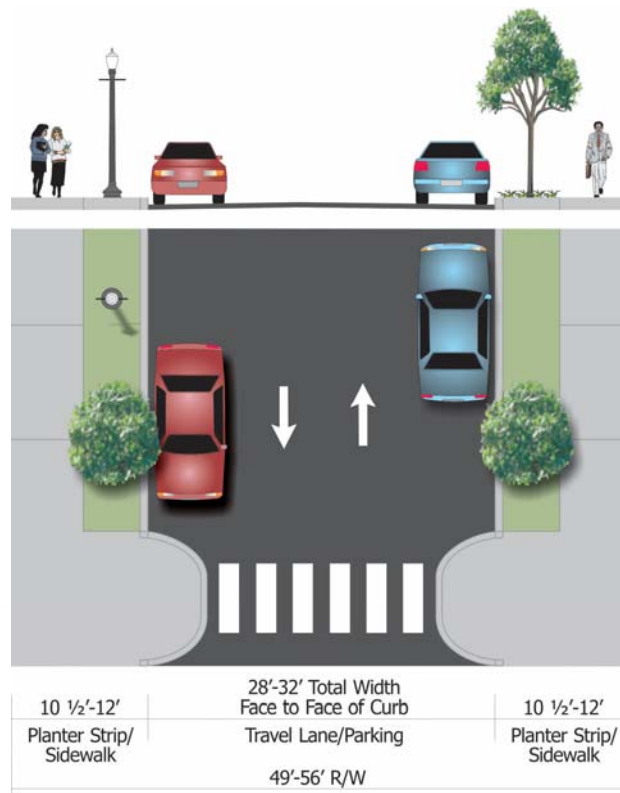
COLLECTOR CROSS-SECTION
